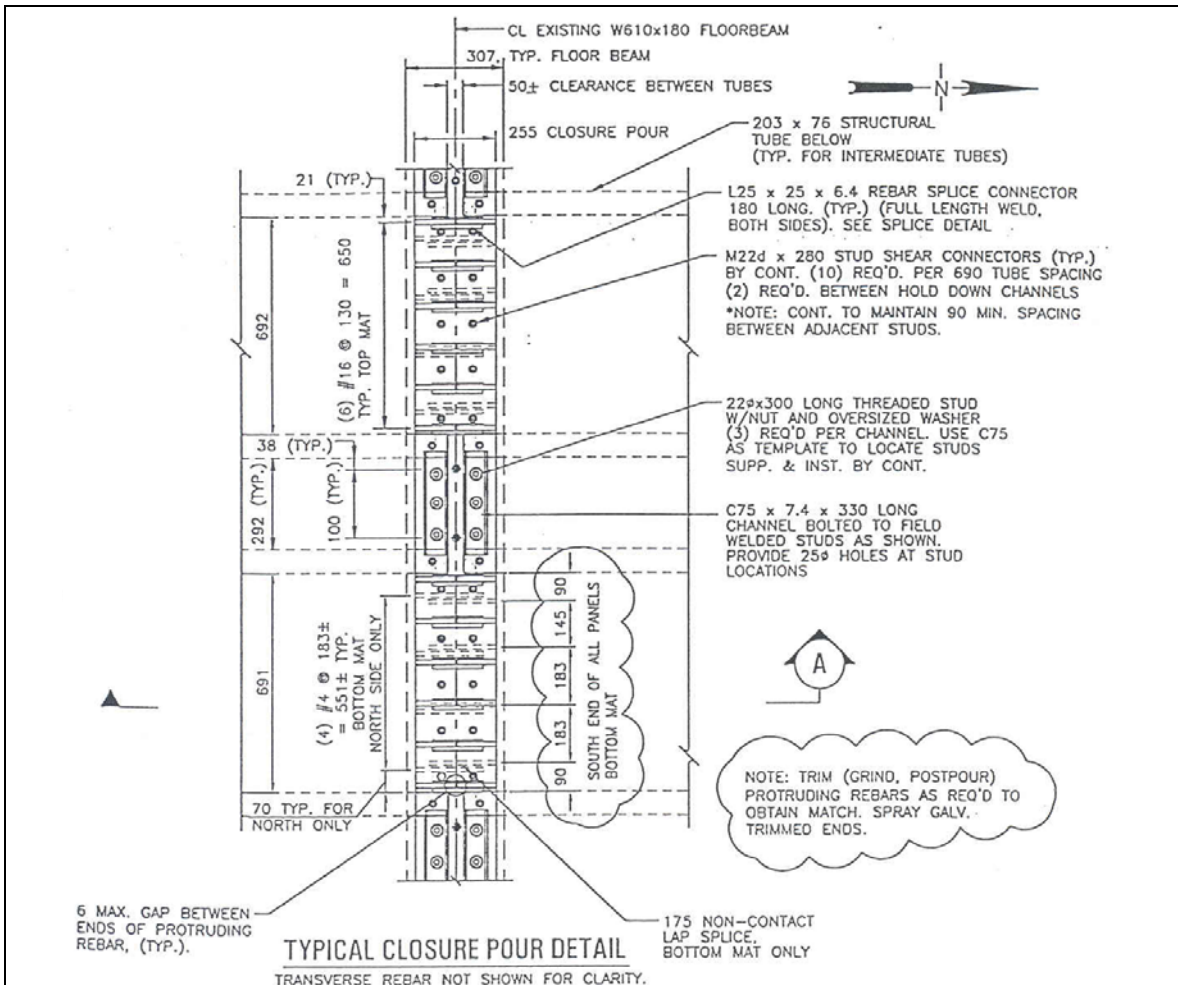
Typical joint plan view for bridge over Cascadilla Creek, Ithaca, NY (The Fort Miller Co., Inc., 2001)
